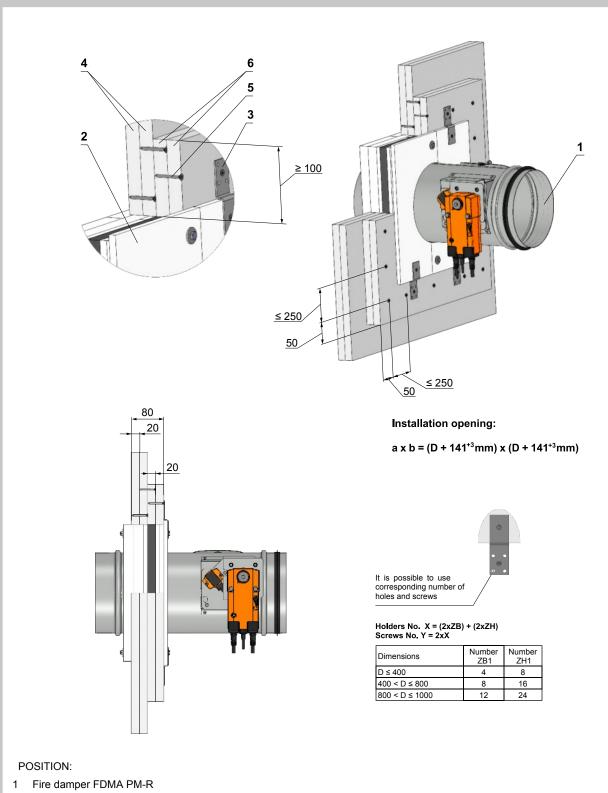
Thin shaft wall - mortar or gypsum - ROUND DAMPER
